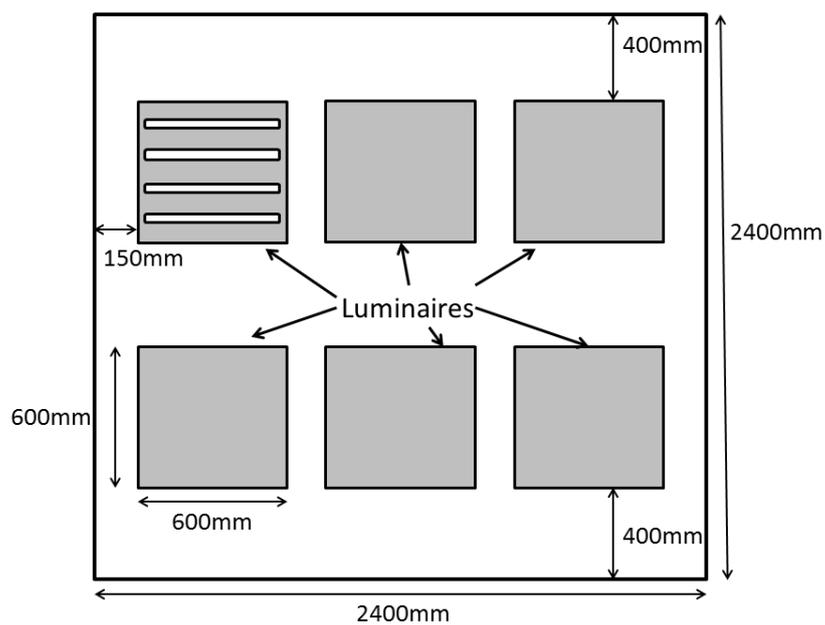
Plan of ceiling to show luminaire array. Each luminaire contains four fluorescent tubes: for this project only two were used and these were arranged symmetrically.
